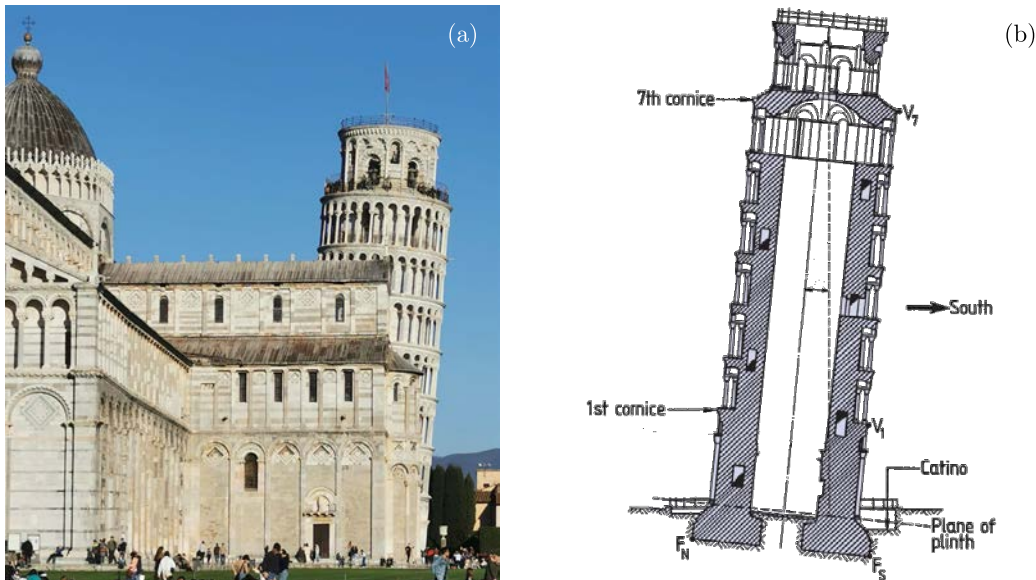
The Leaning Tower of Pisa, seen here (a) playing hide-and-seek (badly) behind the south transept of the Cathedral; (b) vertical section on the plane of maximum tilt (adapted from [2]).
